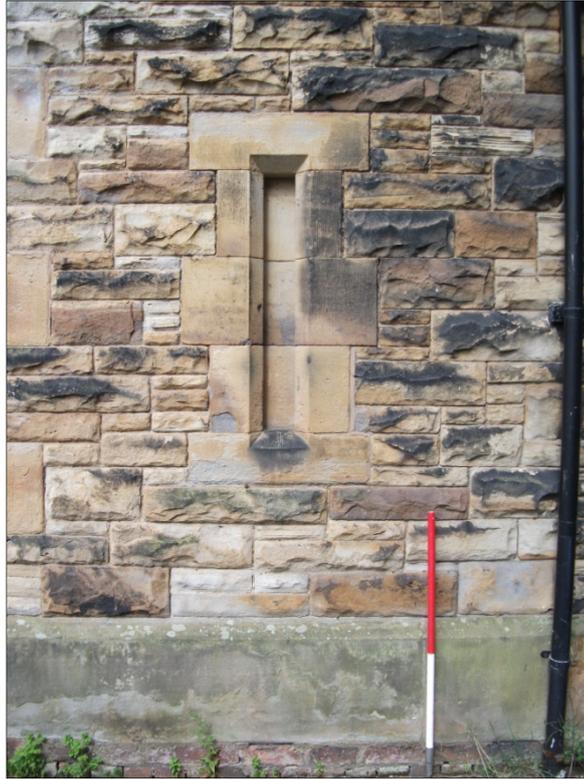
View of the south face of the stone chimney, which abuts the southern elevation of the Bothy, looking N.
